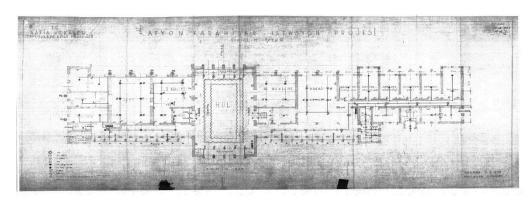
Afyon station project / Ground floor electrical installation plan. Drawn by Ministry of Public Works / Project Office. Date 9.9.1937
